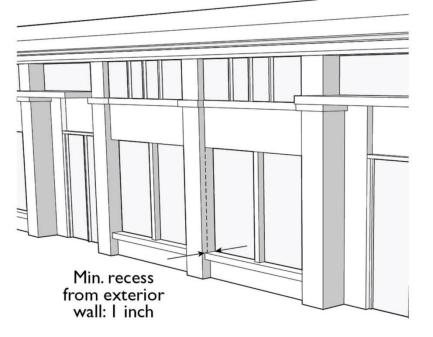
F(5)(a): WINDOW TRIM OR RECESS—MU DISTRICTS
